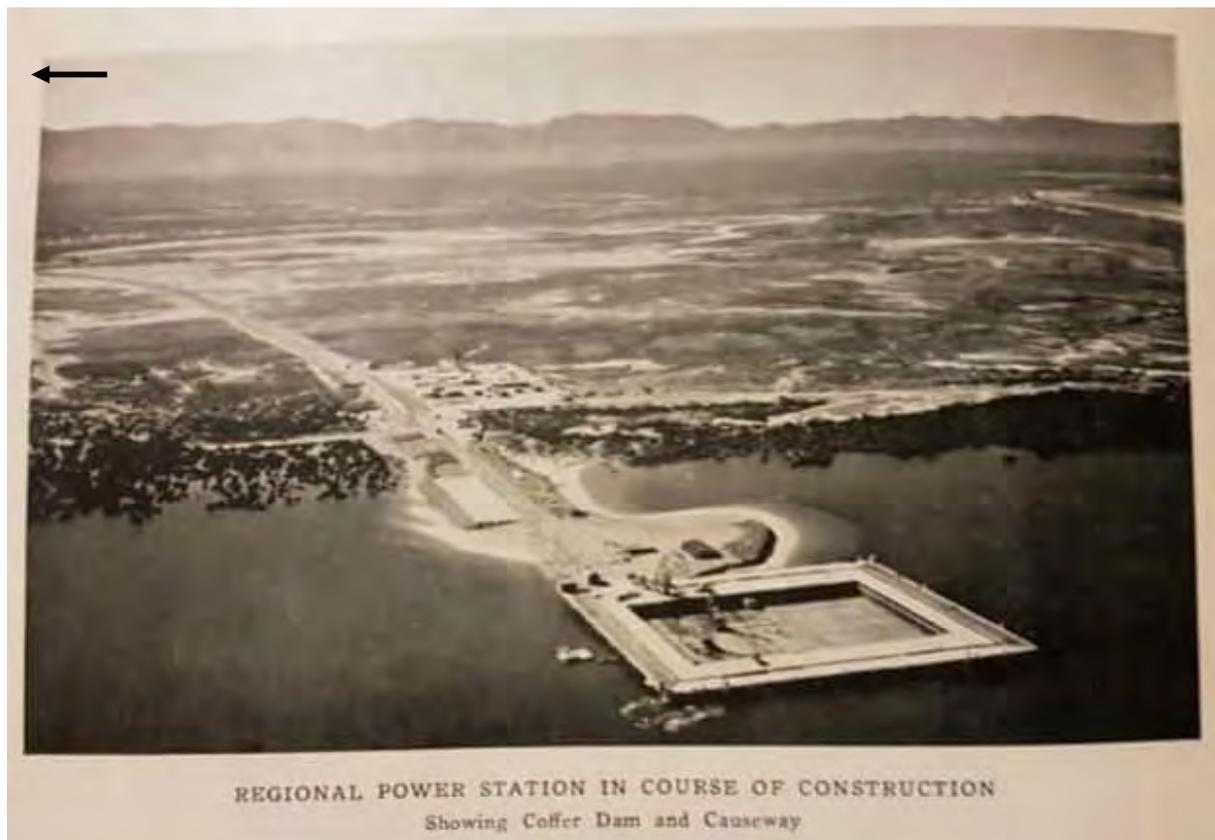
Playford A Station foundation construction, circa 1950's (FPP)
